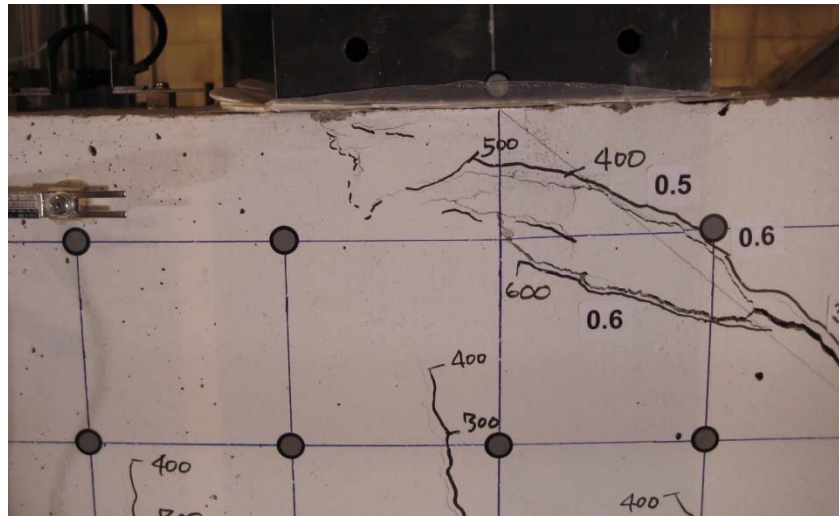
Cracks beneath loading plate B at load stage 8 ($P= 812$ kN).
